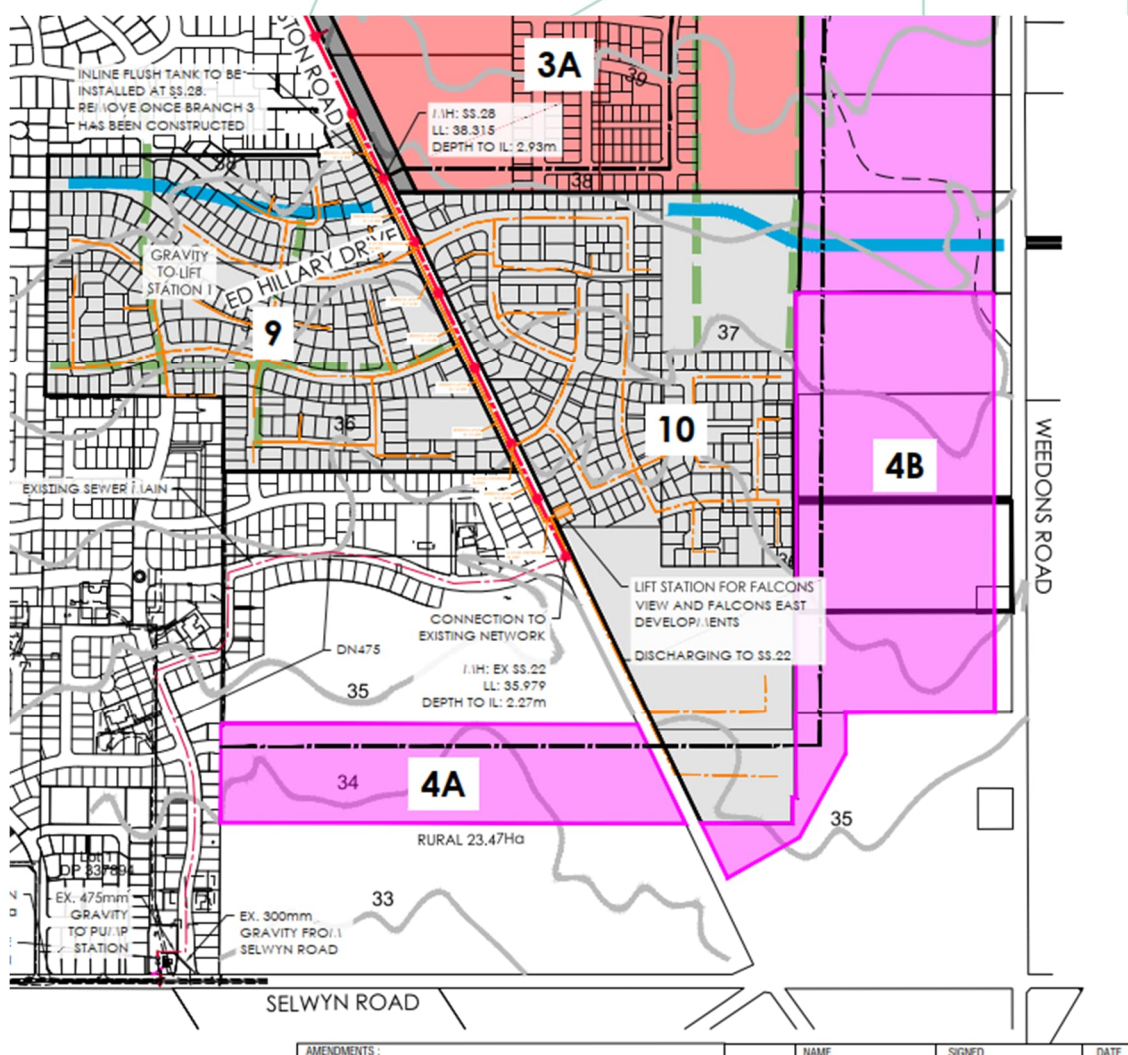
Catchment plan from "South East Rolleston Ultimate Sewer Line" report
